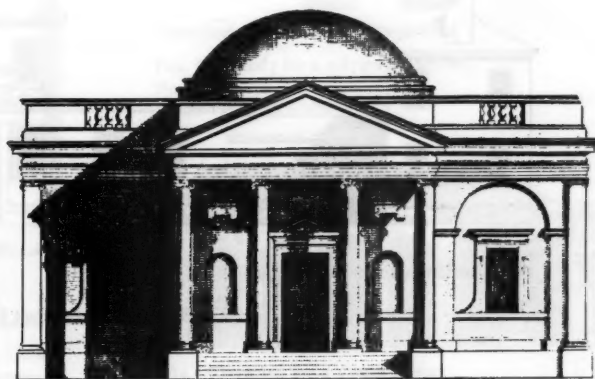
Elevation of a Garden House from Morris' *Select Architecture*, plate 43.
